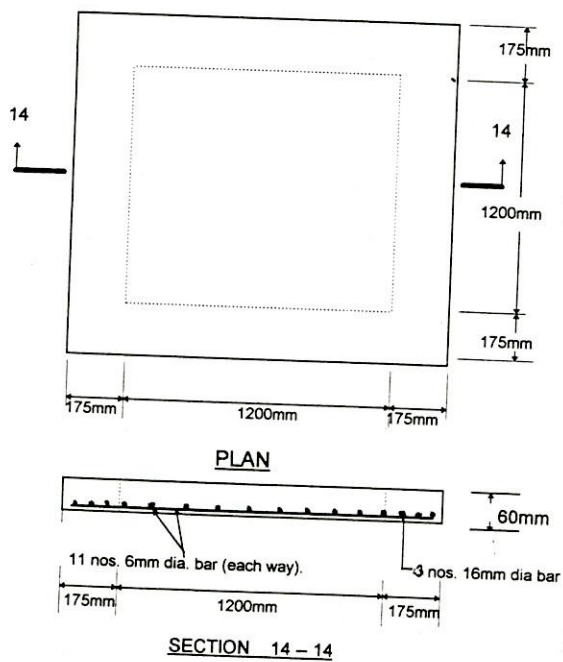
(a) Plan (b) Section and reinforcement details of SLAB14
